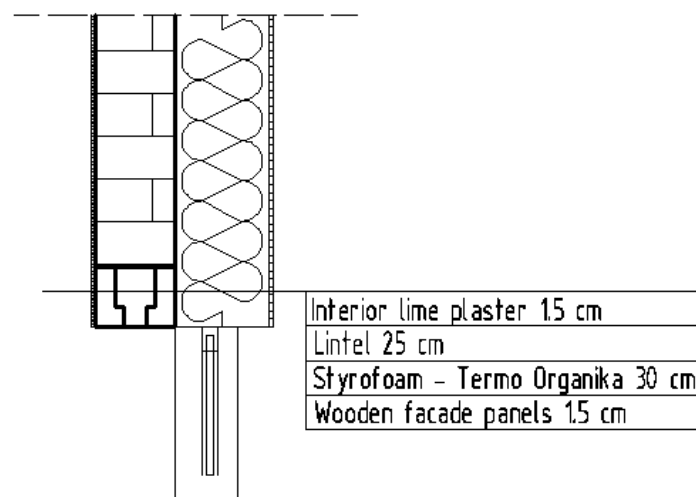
Structure of the exterior wall at the window lintel covered with panels.
